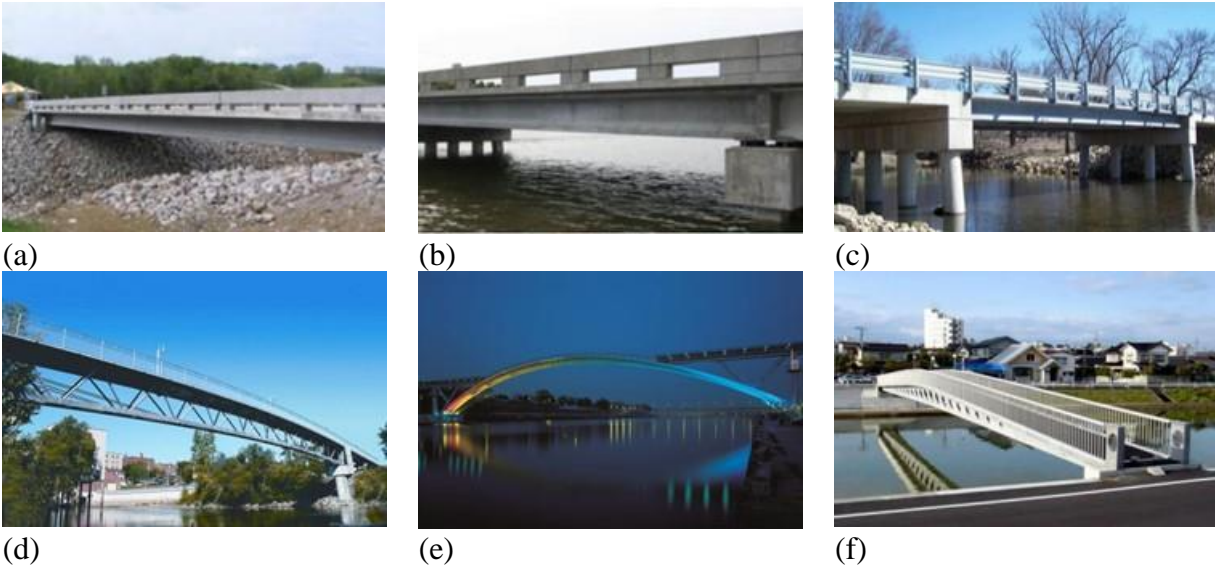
UHPC applications (a) Mars Hill Bridge, Wapello County, IA, (b) Route 64 over Cat Point Creek, Richmond County, VA, (c) Jakway Park Bridge, Buchanan County, IA, (d) Pedestrian bridge, Sherbrooke, Quebec, Canada, (e) Footbridge of Peace, Seoul, South Korea, (f) Sakata-Mirai bridge, Sakata, Japan. (FHWA-HRT-13-060)
